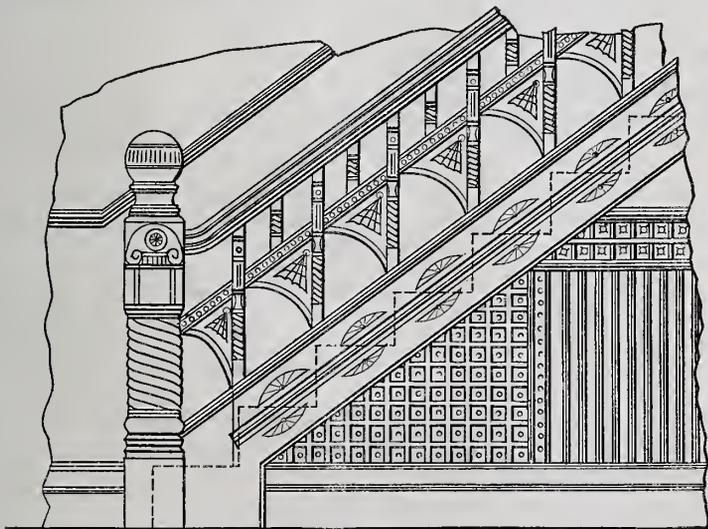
Elevation of Main Stairs and Wainscoting in Vestibule.—Scale, 1/2 Inch to the Foot.
